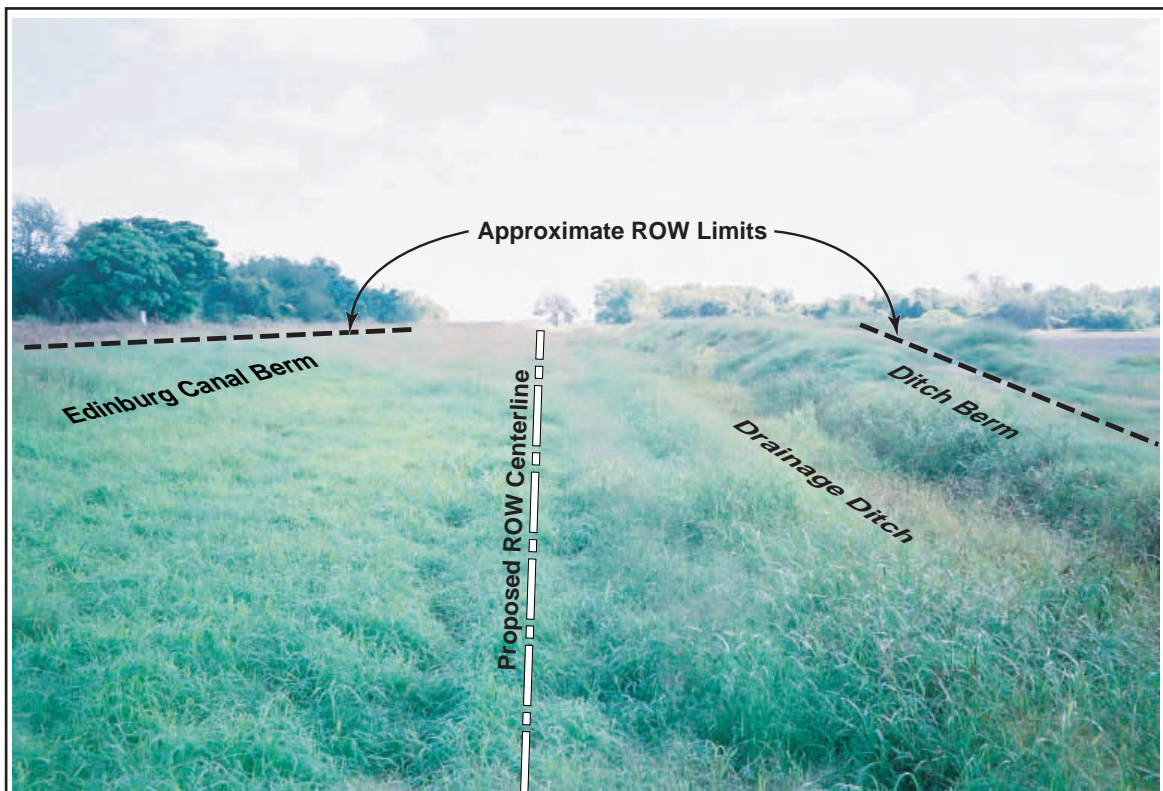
Staked ROW between Edinburg Canal berm on left and ditch on right, view to northeast from West Military Road.
